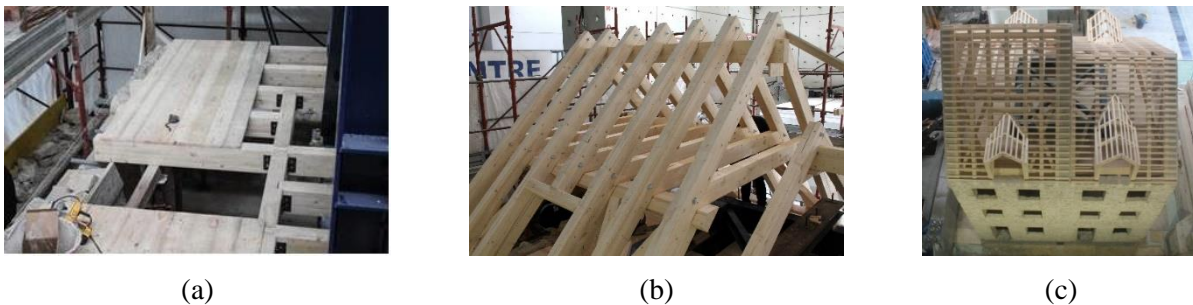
Building aggregate prototype: (a) timber floor framing; (b) timber roof trusses with 45° slope; (c) tile battens and dormers.
